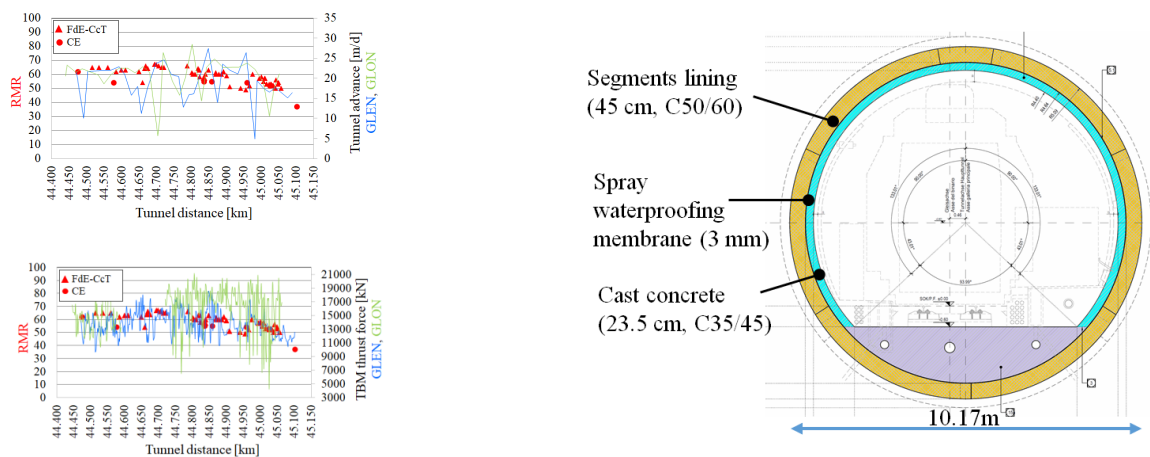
Main tunnels excavation: RMR, tunnel advance and thrust (left) and cross section of main tunnel inside Emergency Stop in Trens (right).
